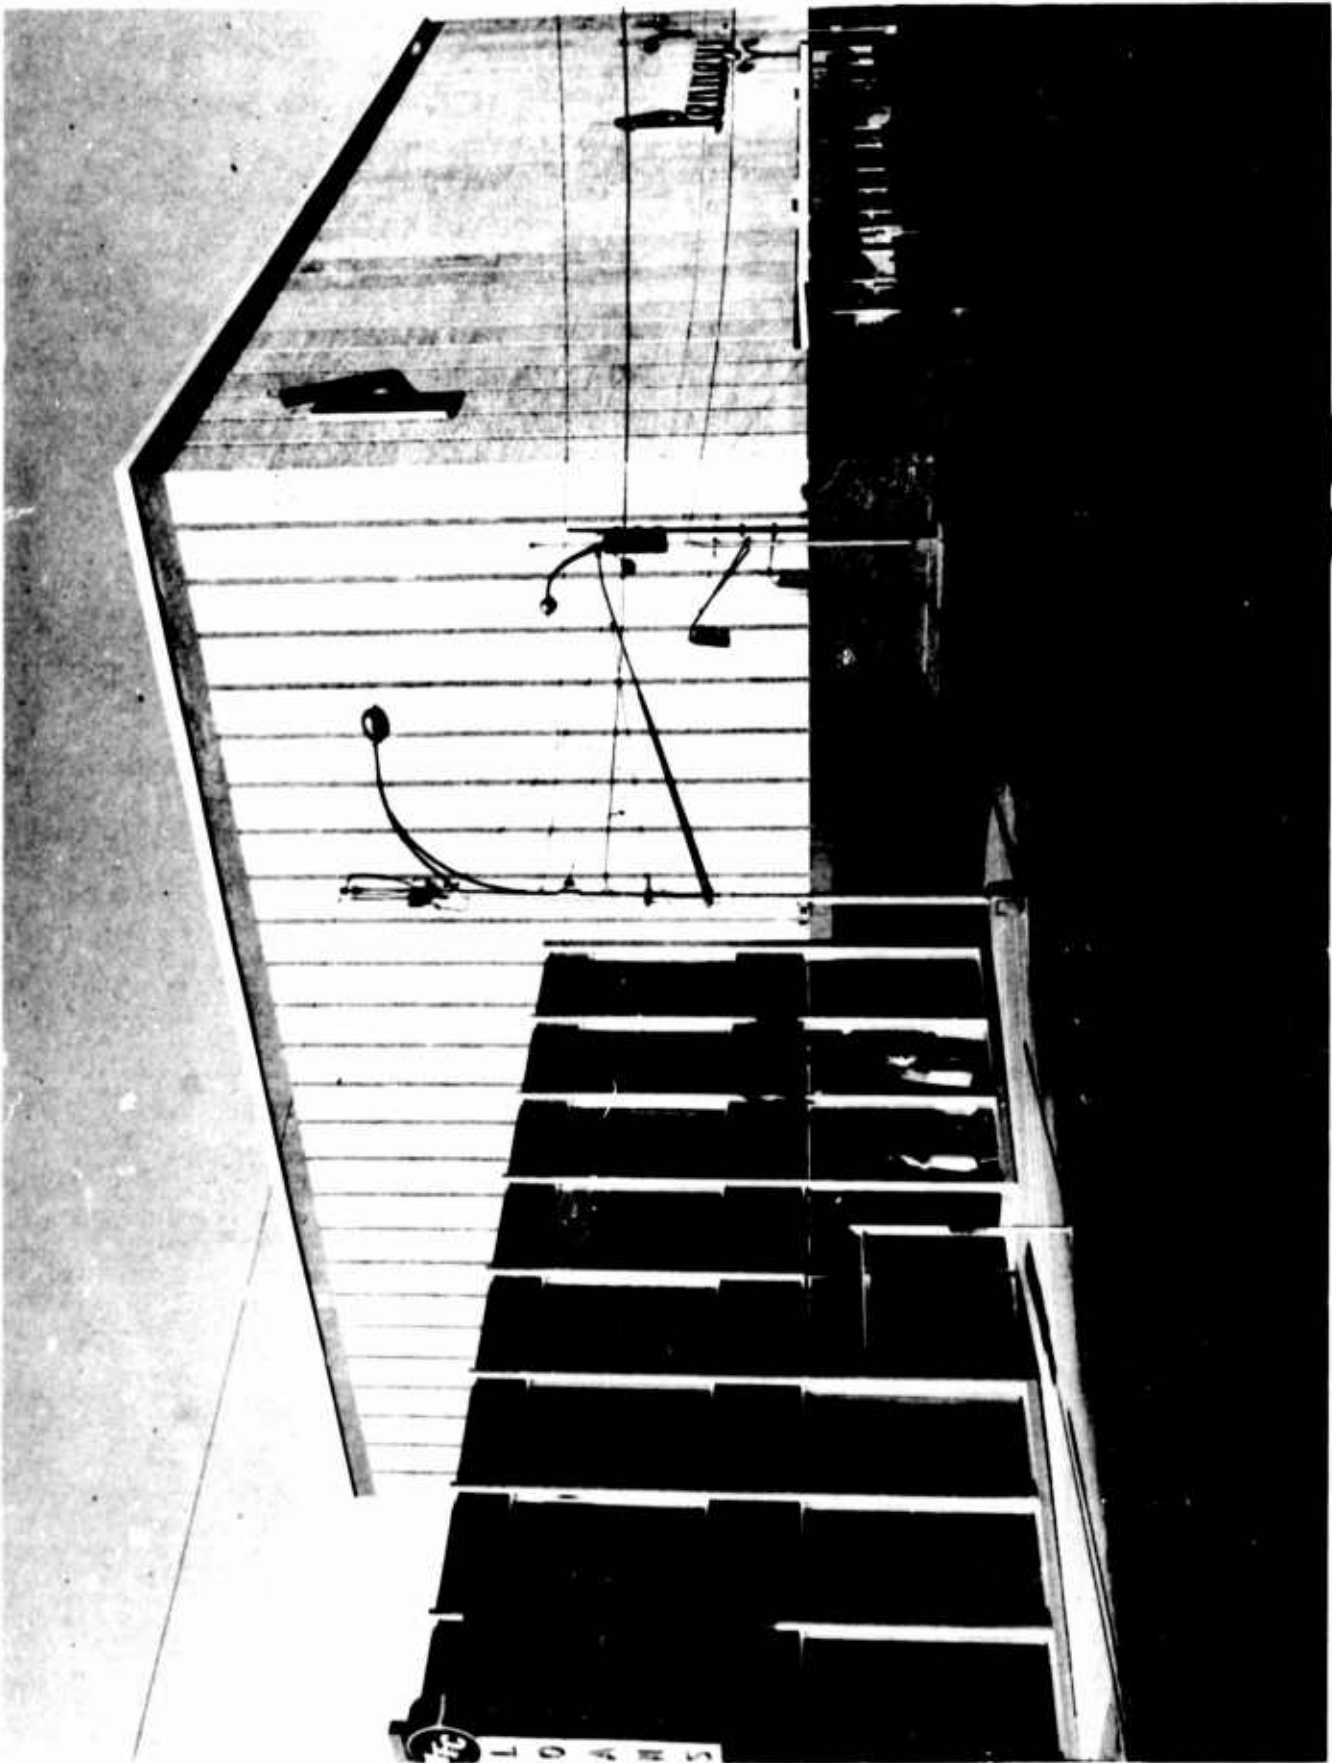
J. C. Penney Building (Fallen precast reinforced-concrete curtain wall panels along the north side of the structure)
